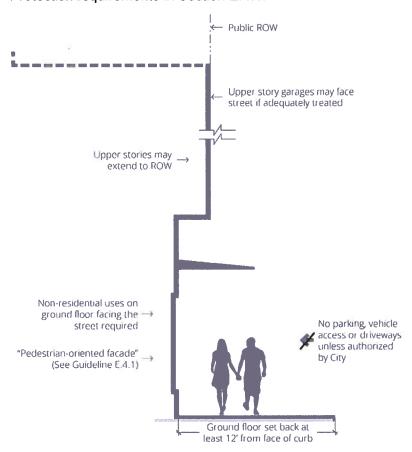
f. Summary of requirements for building façades facing a designated pedestrian-oriented street. (This diagram is for illustrative purposes only. See Section C.1.2 for stated requirements.)
